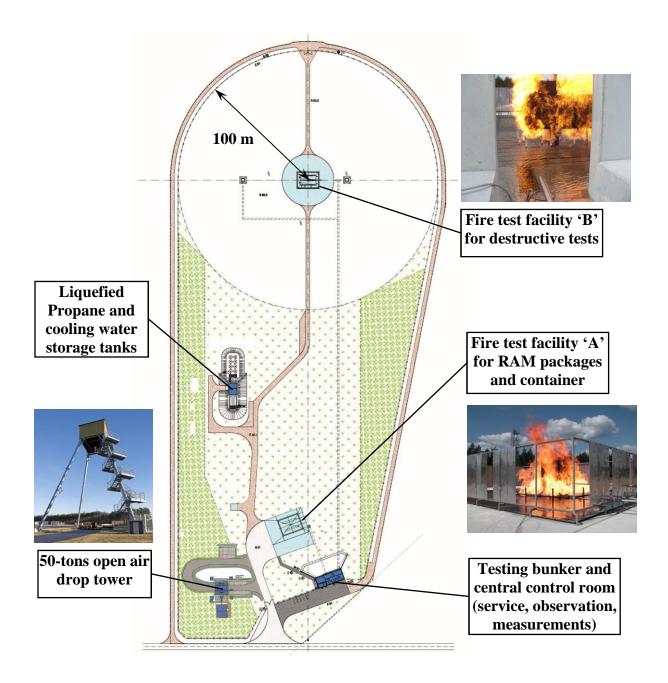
Site plan of the large fire test areal at BAM Test Site Technical Safety
